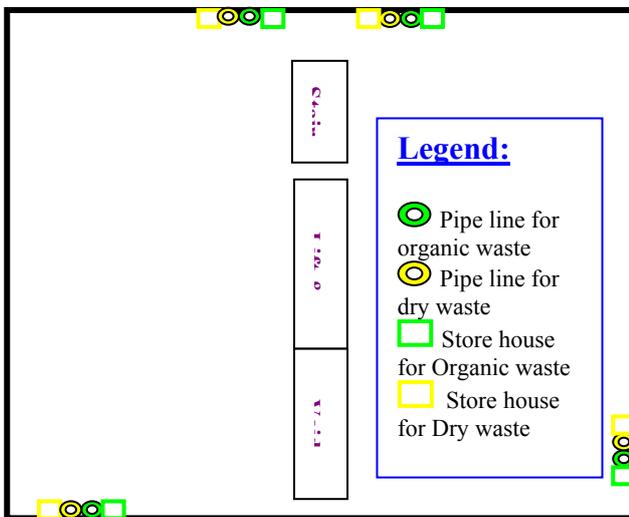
Ground floor plan of a multiunit multistoried building waste isolation and disposal arrangement from the kitchen.
